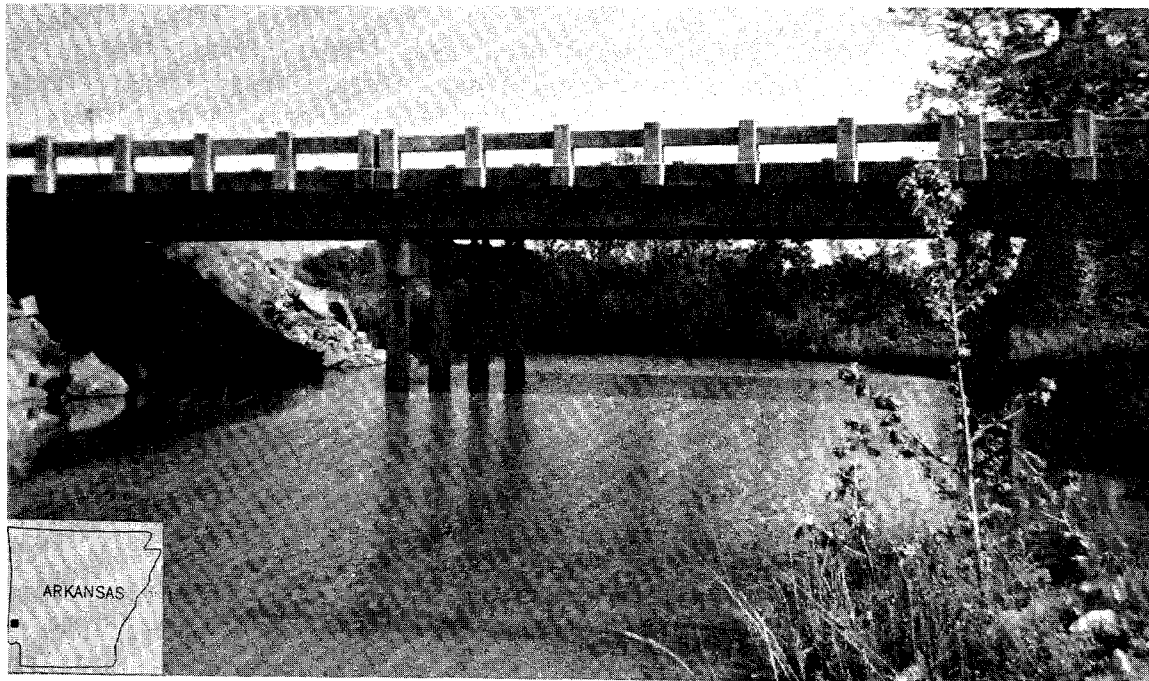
Upstream view of scour channel at US-70 relief bridge on April 27, 1976 and, at left, riprap placed at abutment after erosion of abutment fill.
